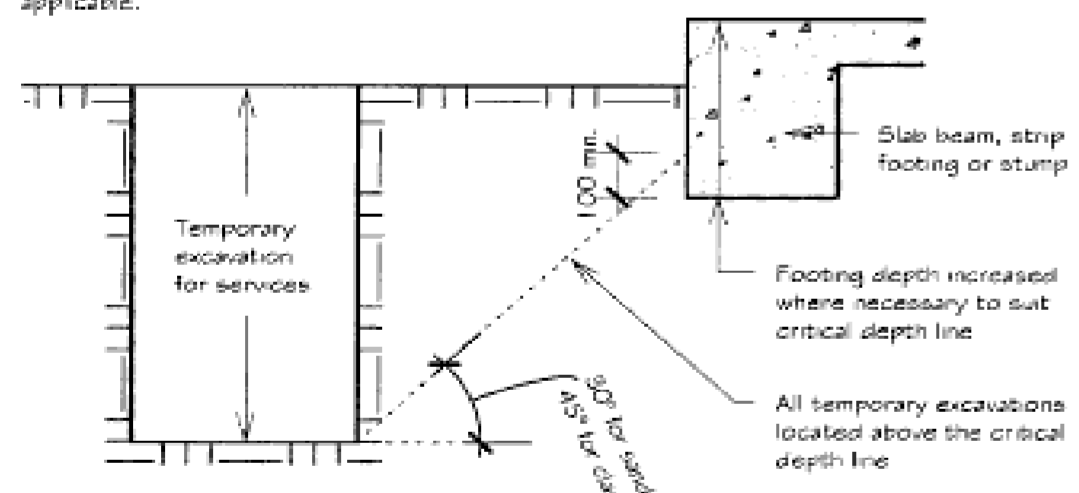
EXCAVATION FOR DRAINS ADJACENT TO FOOTINGS
